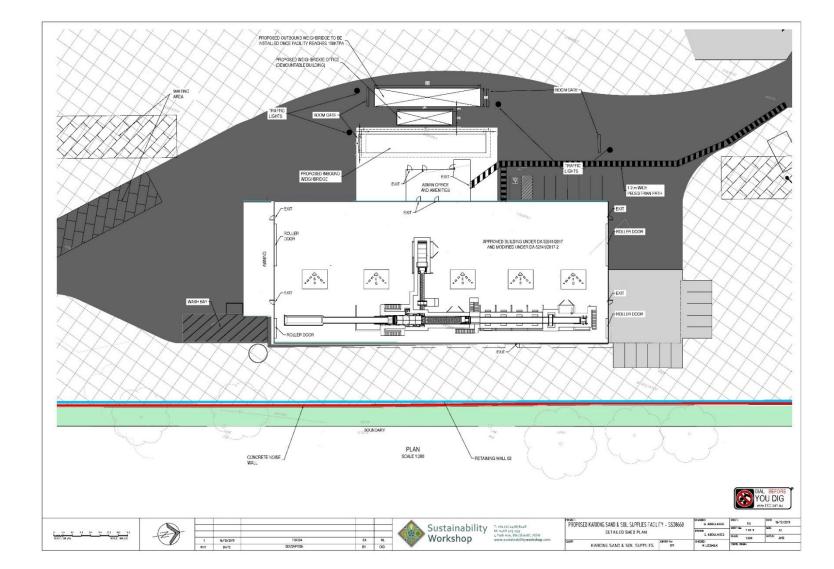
Layout within the Secondary Processing Warehouse (provided in Appendix E).
